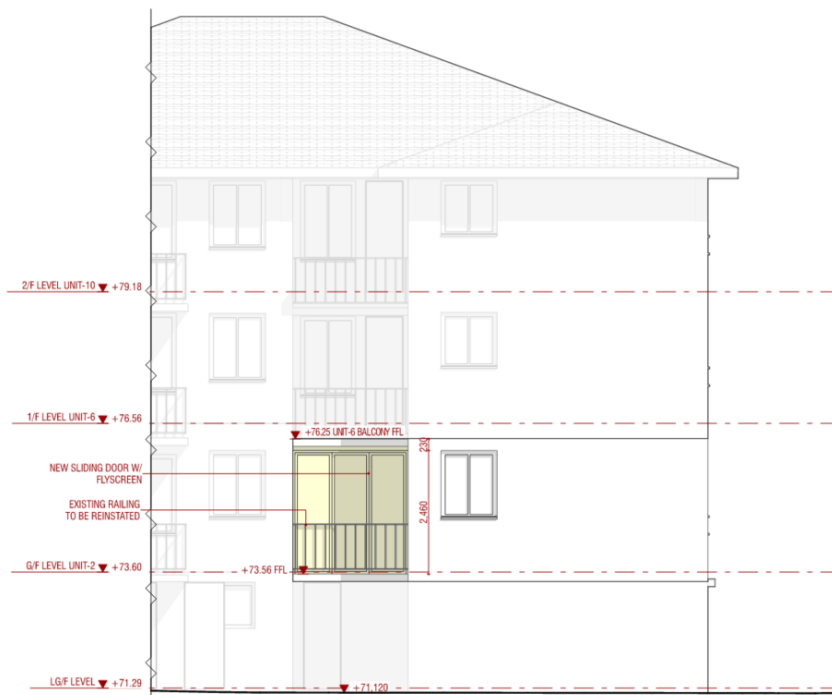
Proposed Unit 2 - North Elevation (Source: Maya Sternberg Architects)
